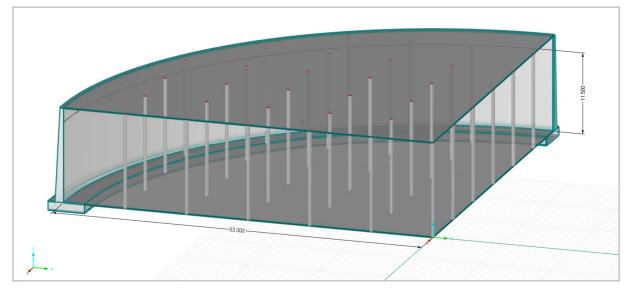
Type1 - Conventional above ground post-tensioned circular reinforced concrete reservoir (m)
